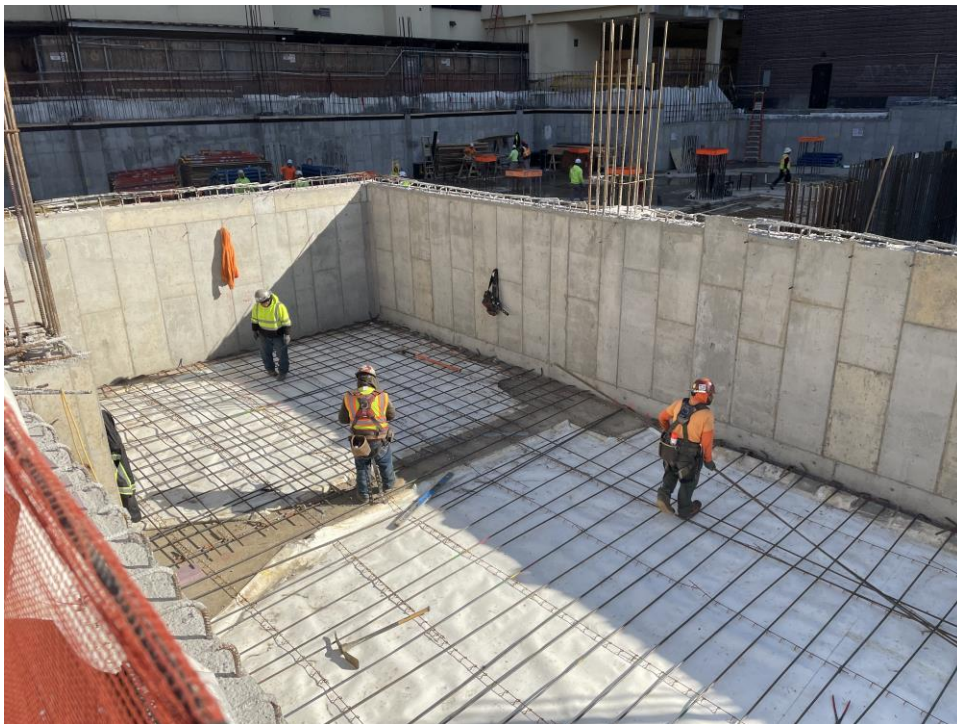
ECD installing rebar in the northwestern part of the site (facing northeast).
